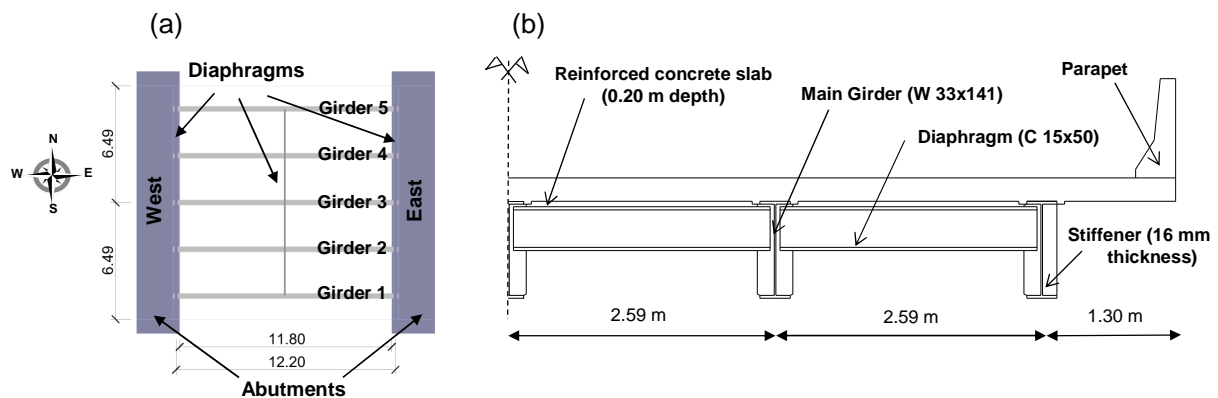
Bridge definition. (a) Plan view (without the concrete slab), (b) half section.
